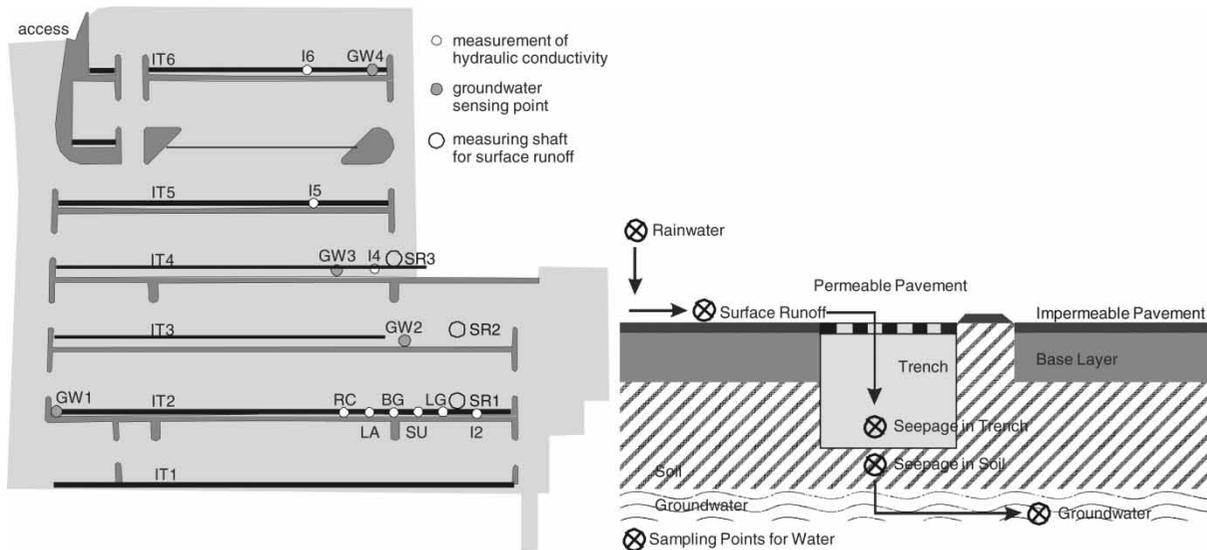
| Layout of the investigated parking area with measuring equipment and points (left side) and cross section of permeable pavement and infiltration trench (right side).
